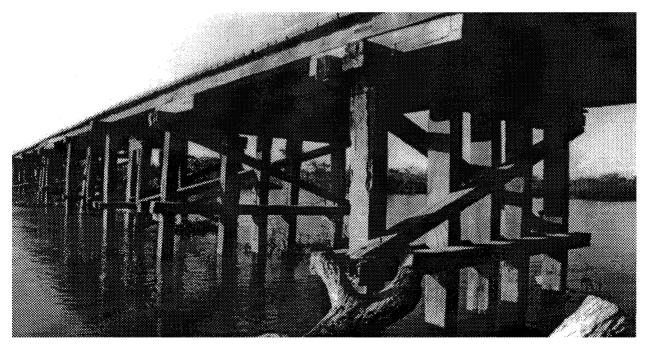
Single sawn lumber beam bridge over Jauru river. This bridge is 60 meters long, 5 meters span, consists of five longitudinal single sawn lumber beams of aroeira specie.
